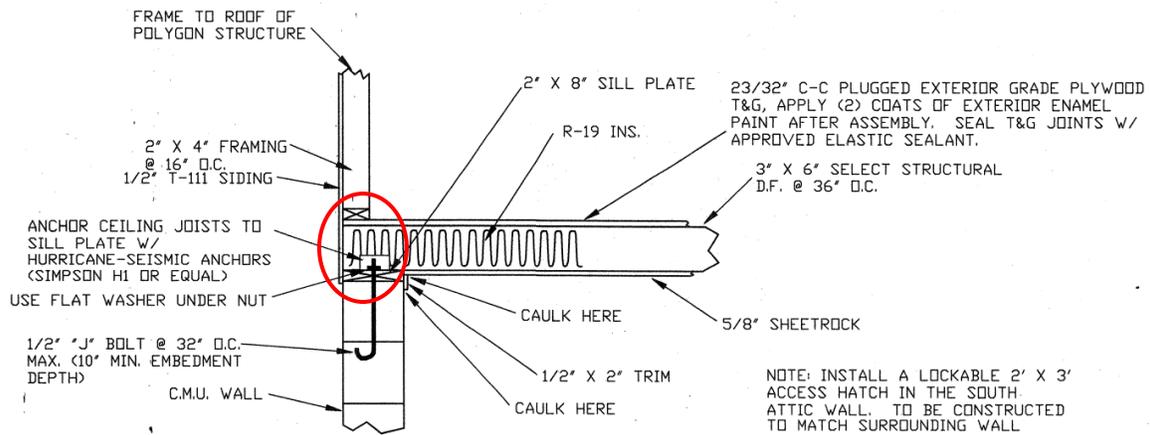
Inadequate Blocking and Masonry Wall Out-of-Plane Anchorage
